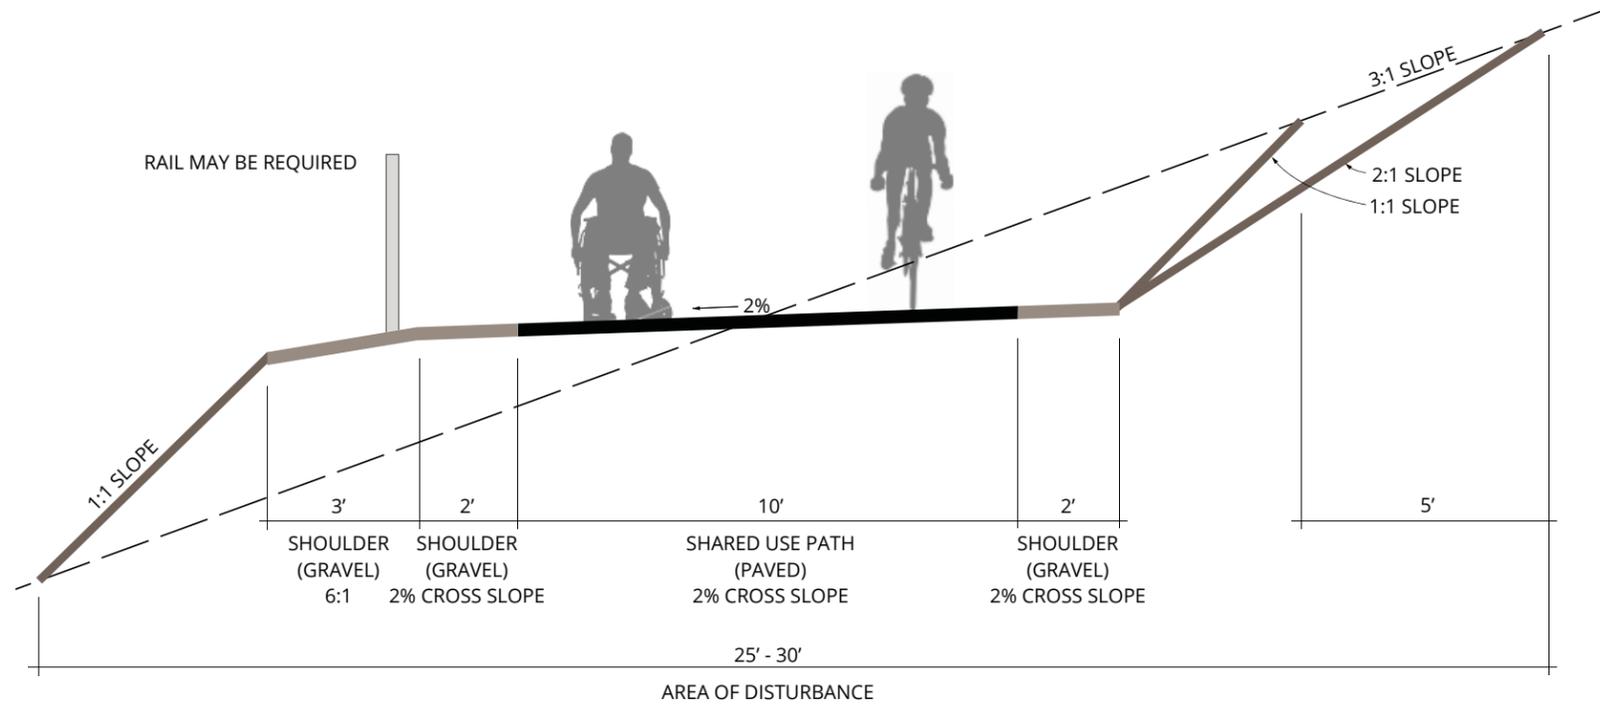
F: Cross-Section on 3:1 Slope - Without Walls
